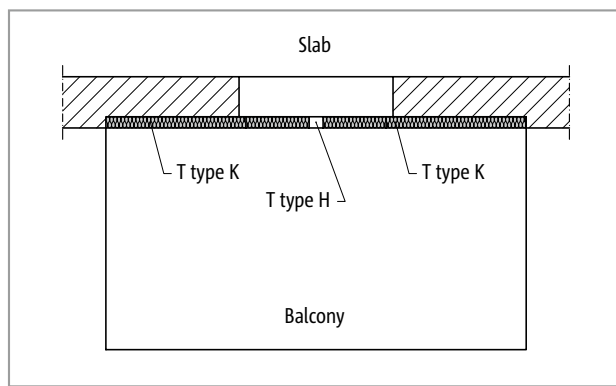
Schöck Isokorb® T type H: Cantilevered balcony
